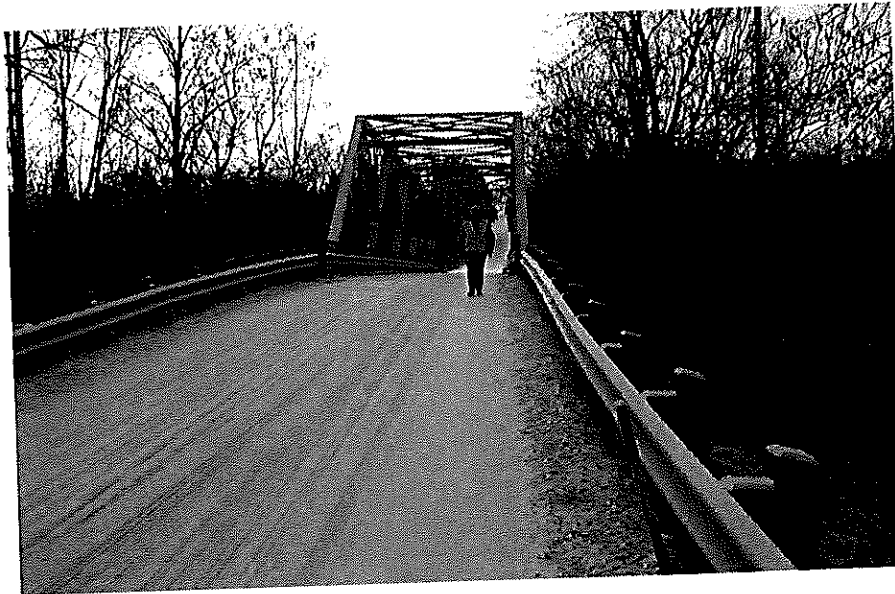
Collingwood Street Bridge (Bridge #000141) looking South from the North Approach
